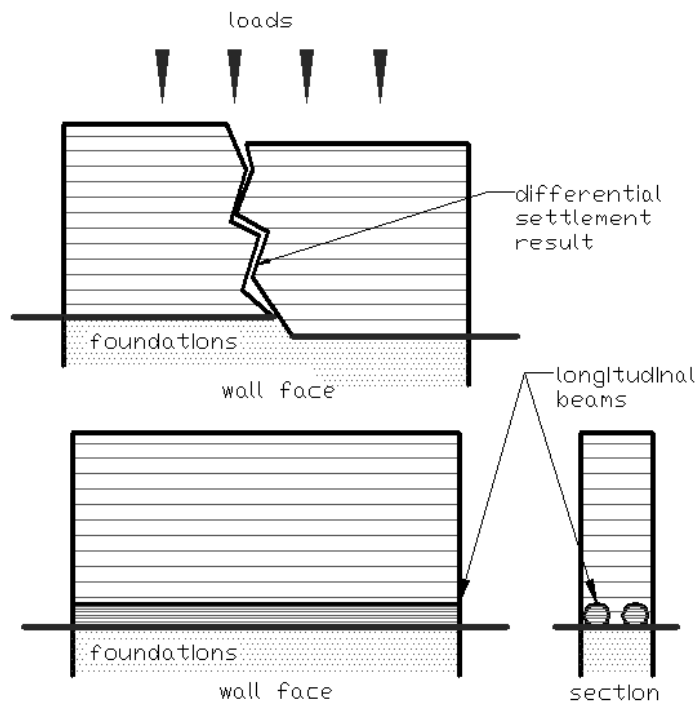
longitudinal beams introduced in massive walls foundations to alleviate differential settlement.
